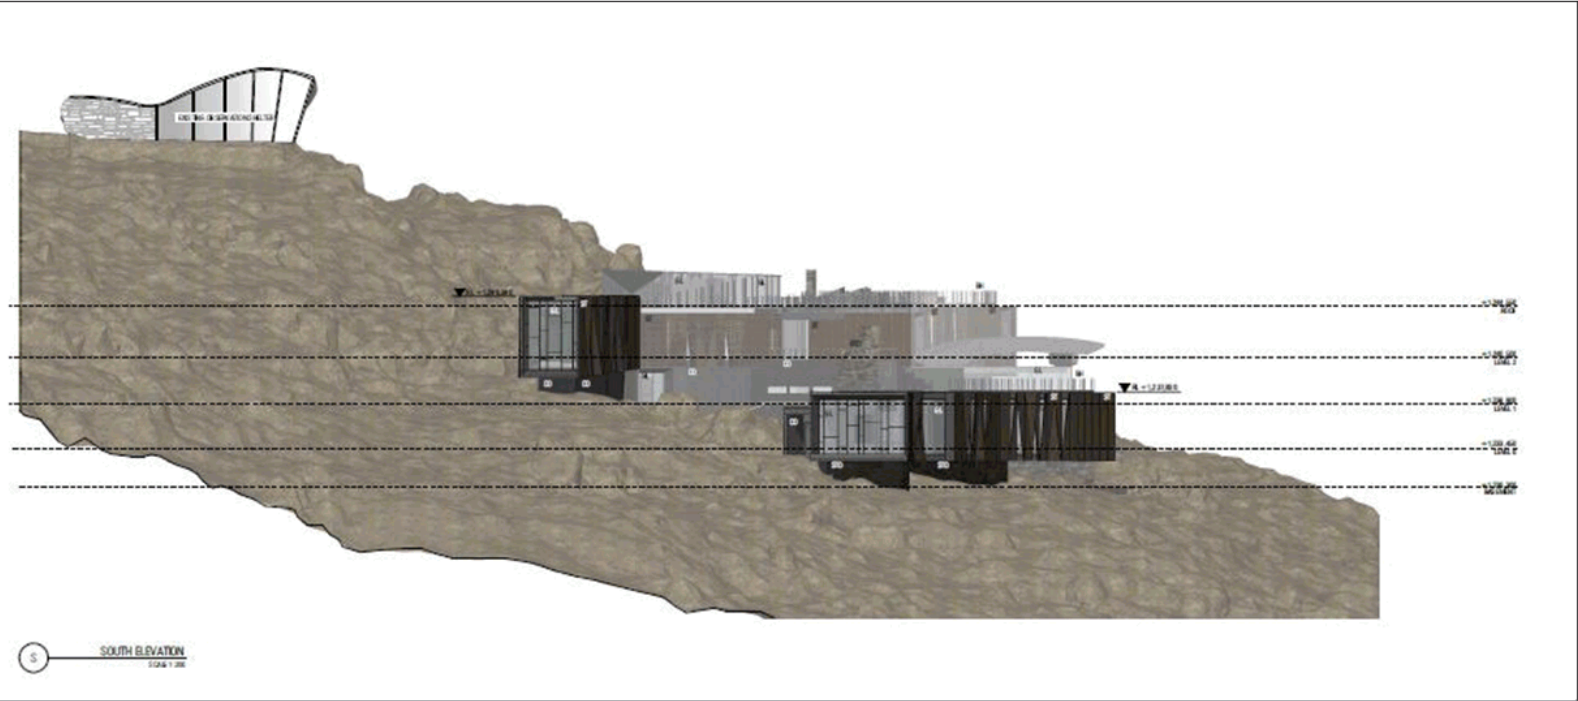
Building design from perspective of southern elevation, showing north and south sections of the building, the adjoining enclosed glass walkway, and the proposed obstructions on eastern face windows that may have posed a reflective risk
